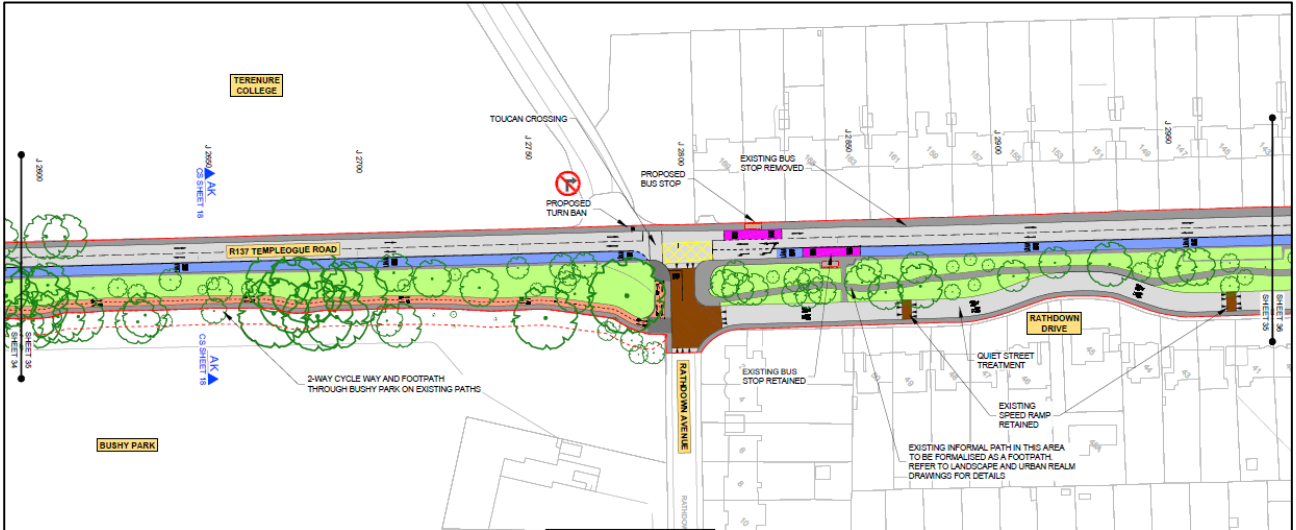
Extract from General Arrangement Drawings (Sheet 35)
